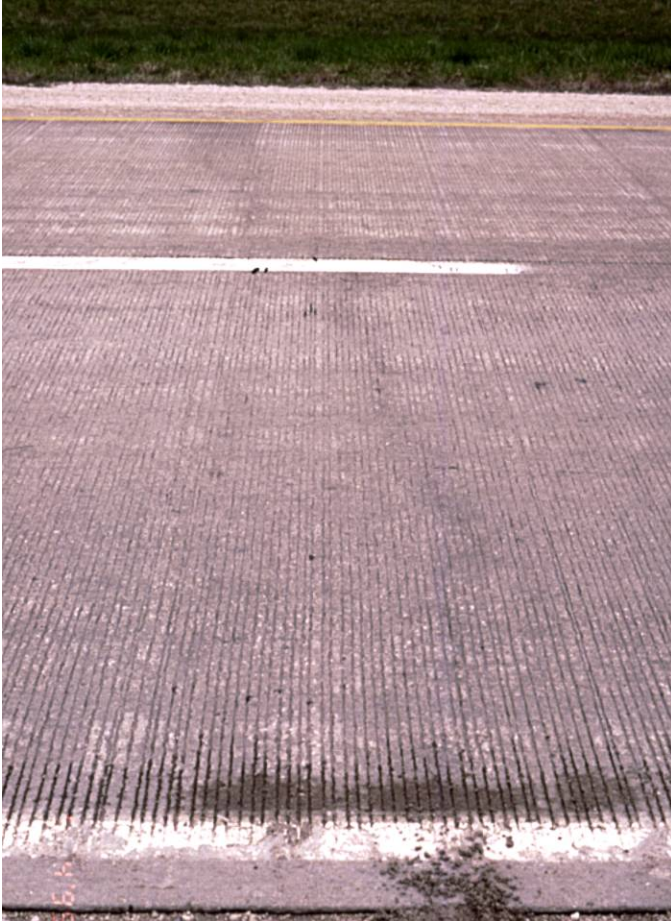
US 20 Webster county reinforced section (1991) Note staining on skew where joint would be on standard pavement section.
